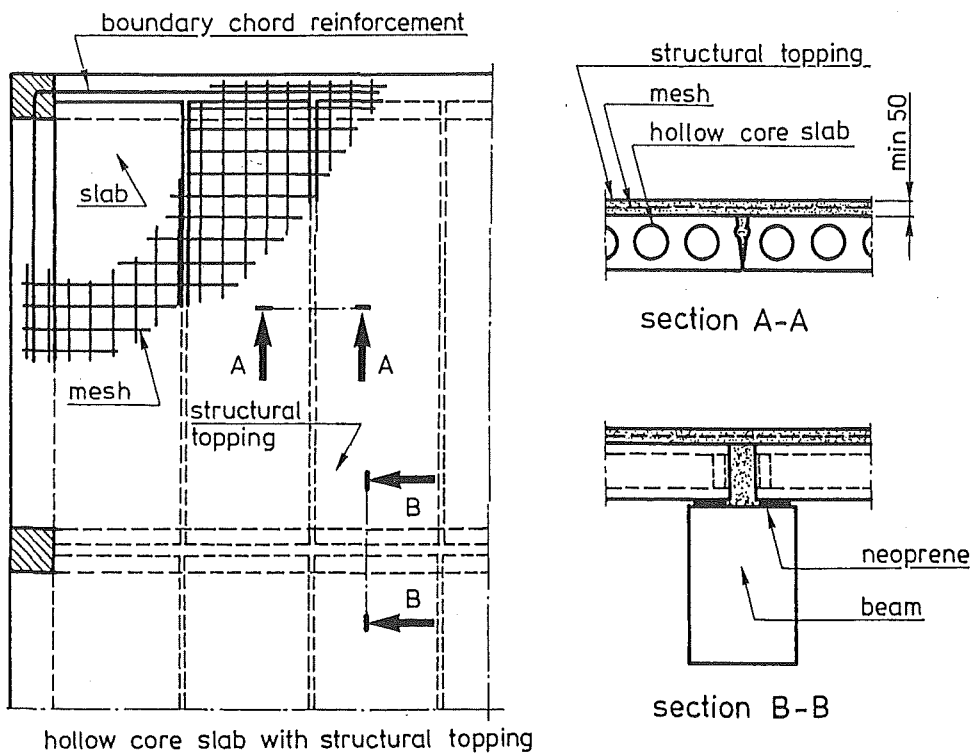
Hollow core floor construction with composite reinforced structural topping [Bruggeling and Huyghe, 1991]
